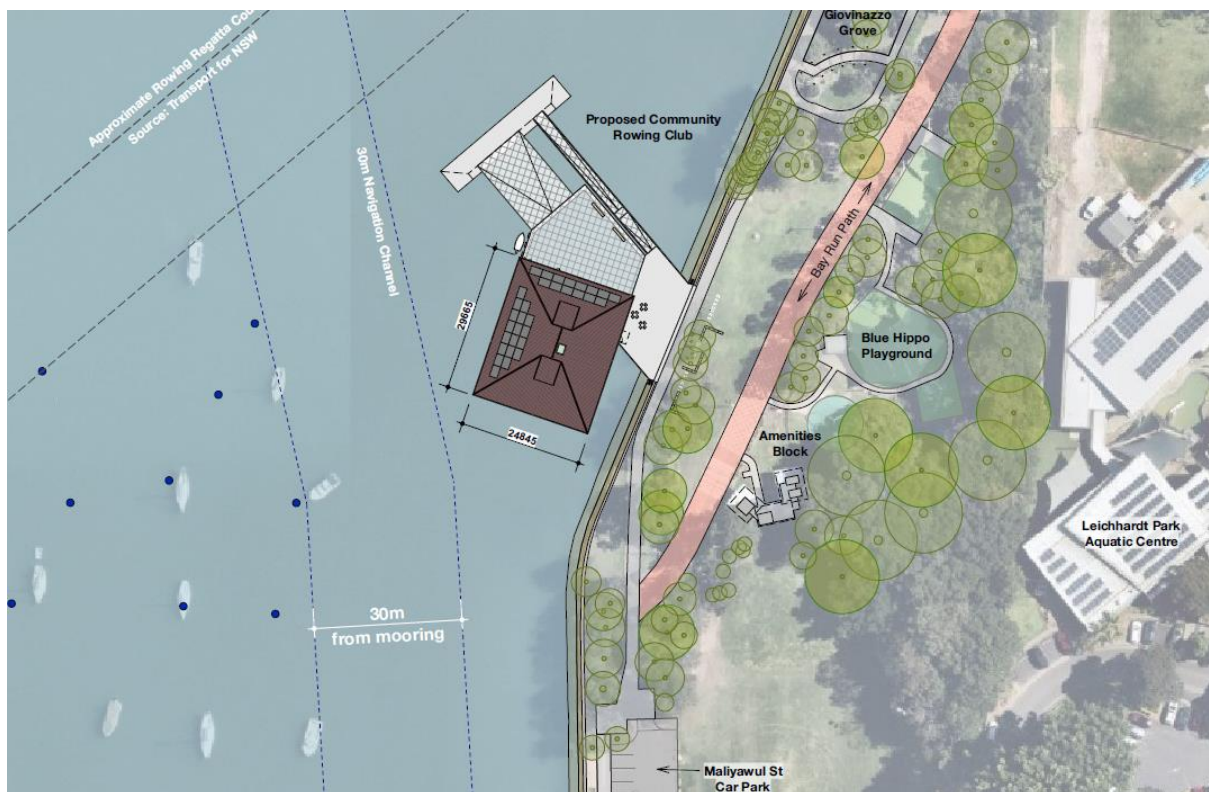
Site Plan showing proposed development location (Source: Hill Thalys)
